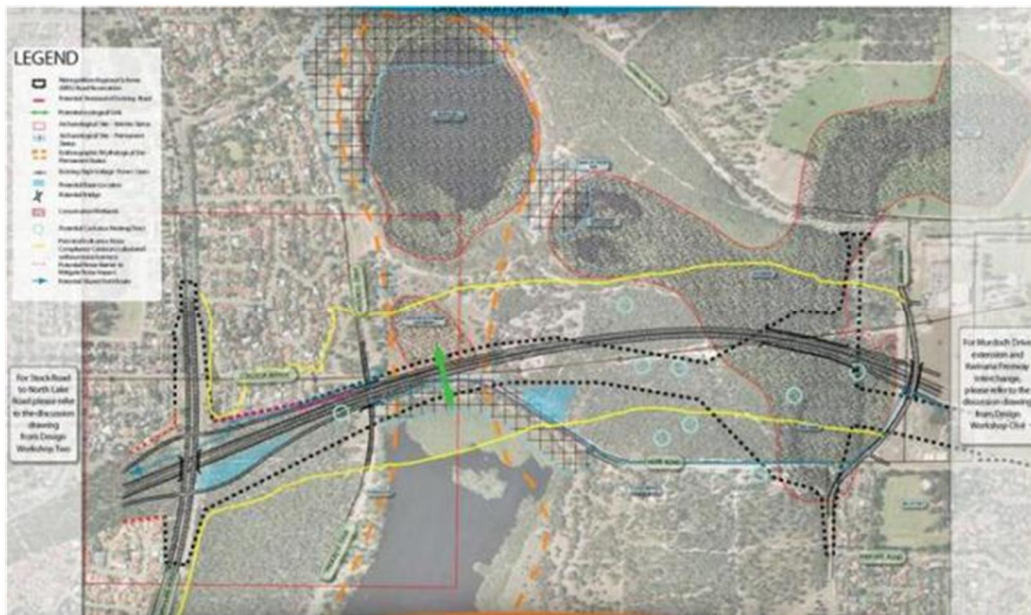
Roe Highway Extension Concept Design – Central Section¹
